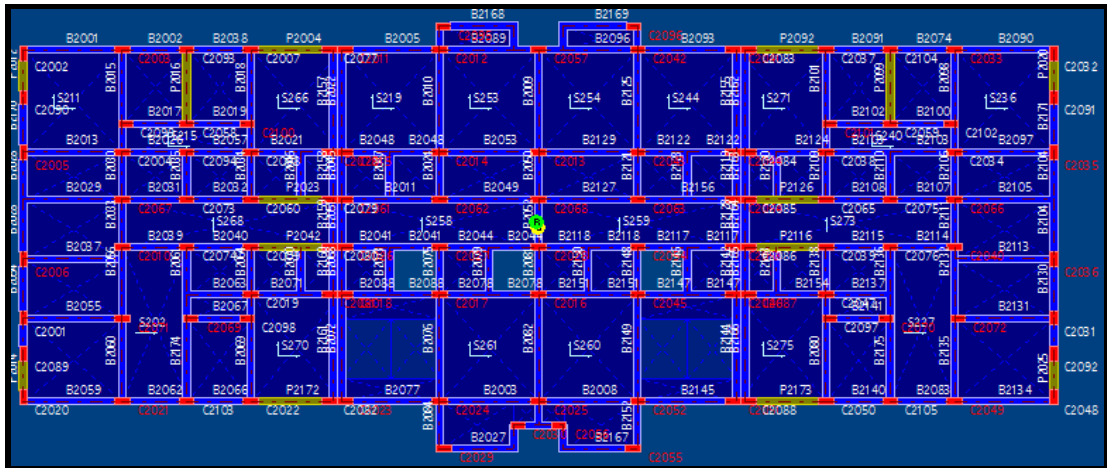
Plan of a Building with Fifteen Stories and Coupled Shear Wall System
